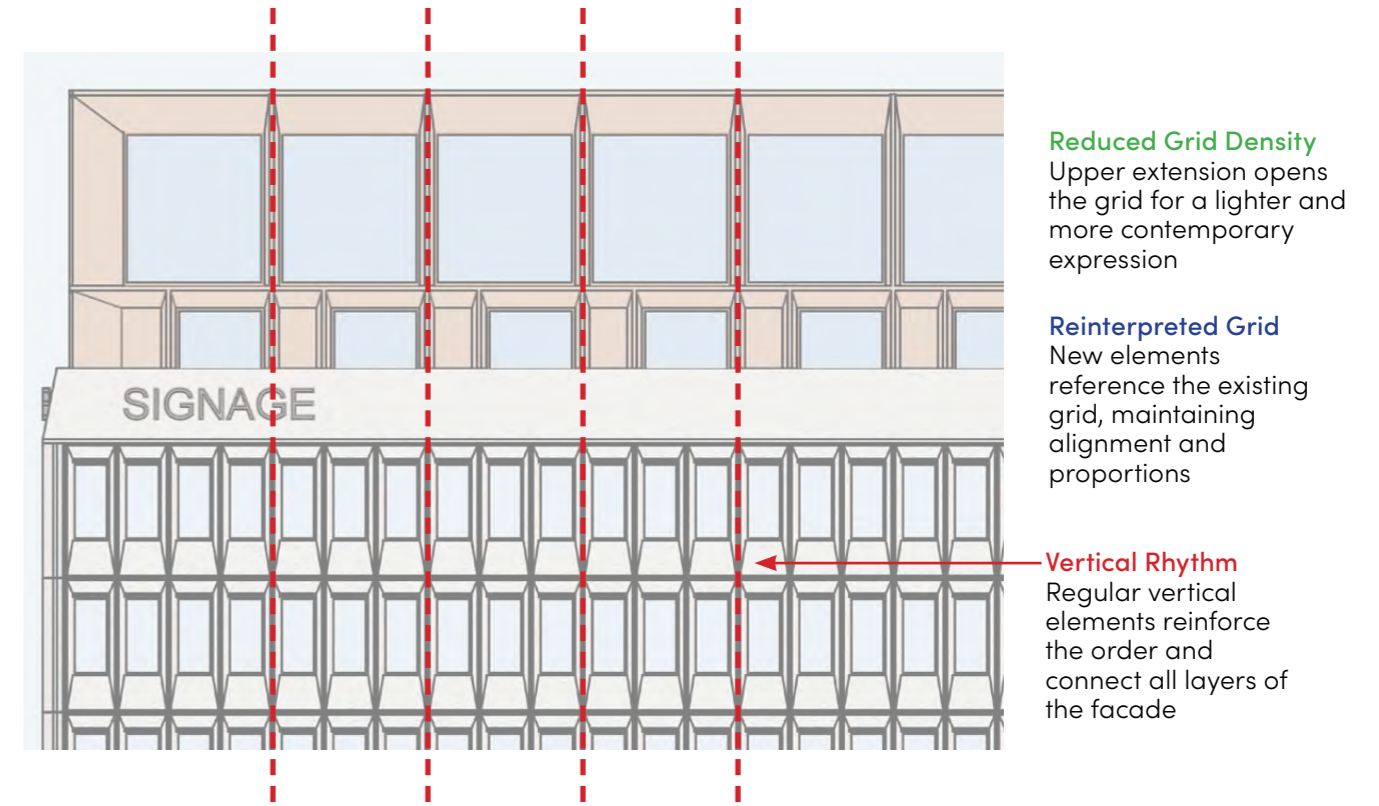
New 'cap' to the Tower Block replacing the overgrown plant area. Source: MCORM, 2026.
